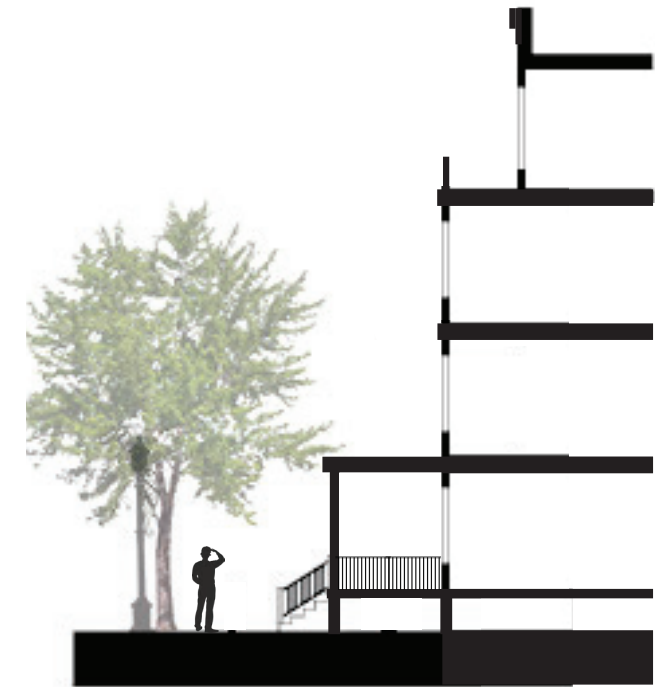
Section view illustrating how townhouse and low-rise building is defined by a base, middle wall and cap along a street or public space.
